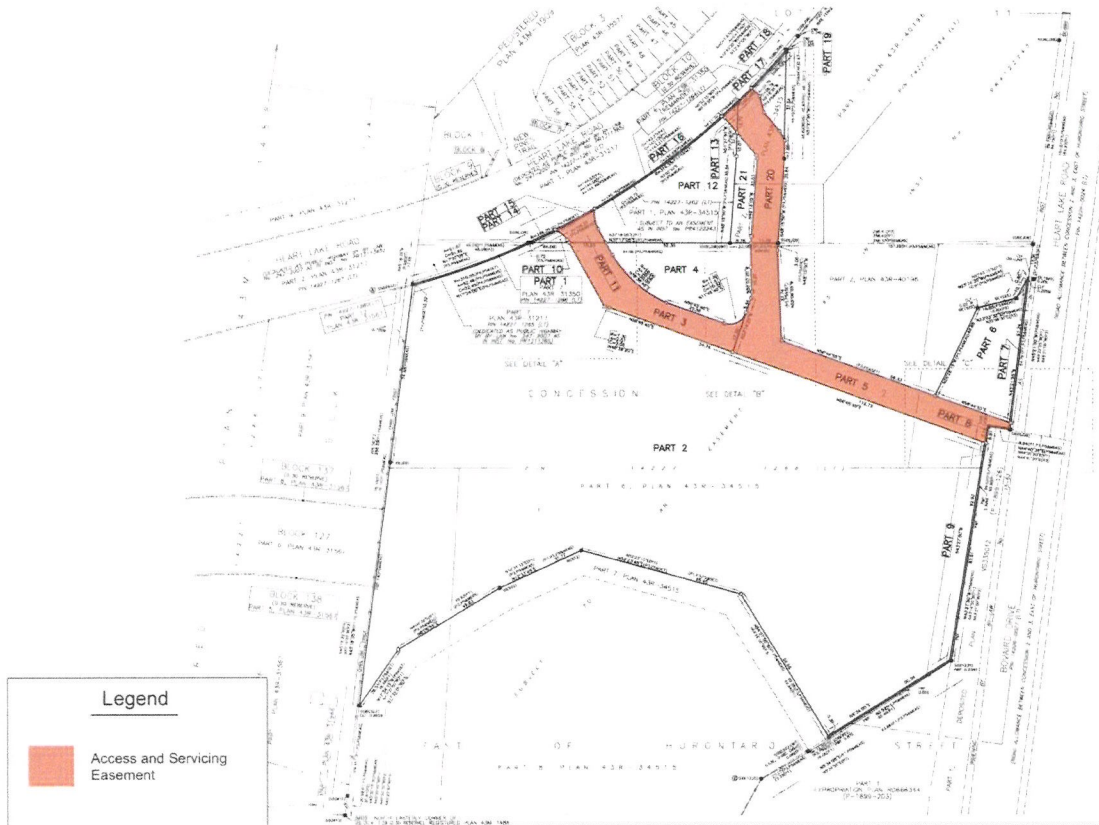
Site Plan (October 16-24), depicting proposed development and access/servicing easement. Enlarged version available as a separate attachment to this submission (See "Site Plan (Oct 16-24)" in submission package).
